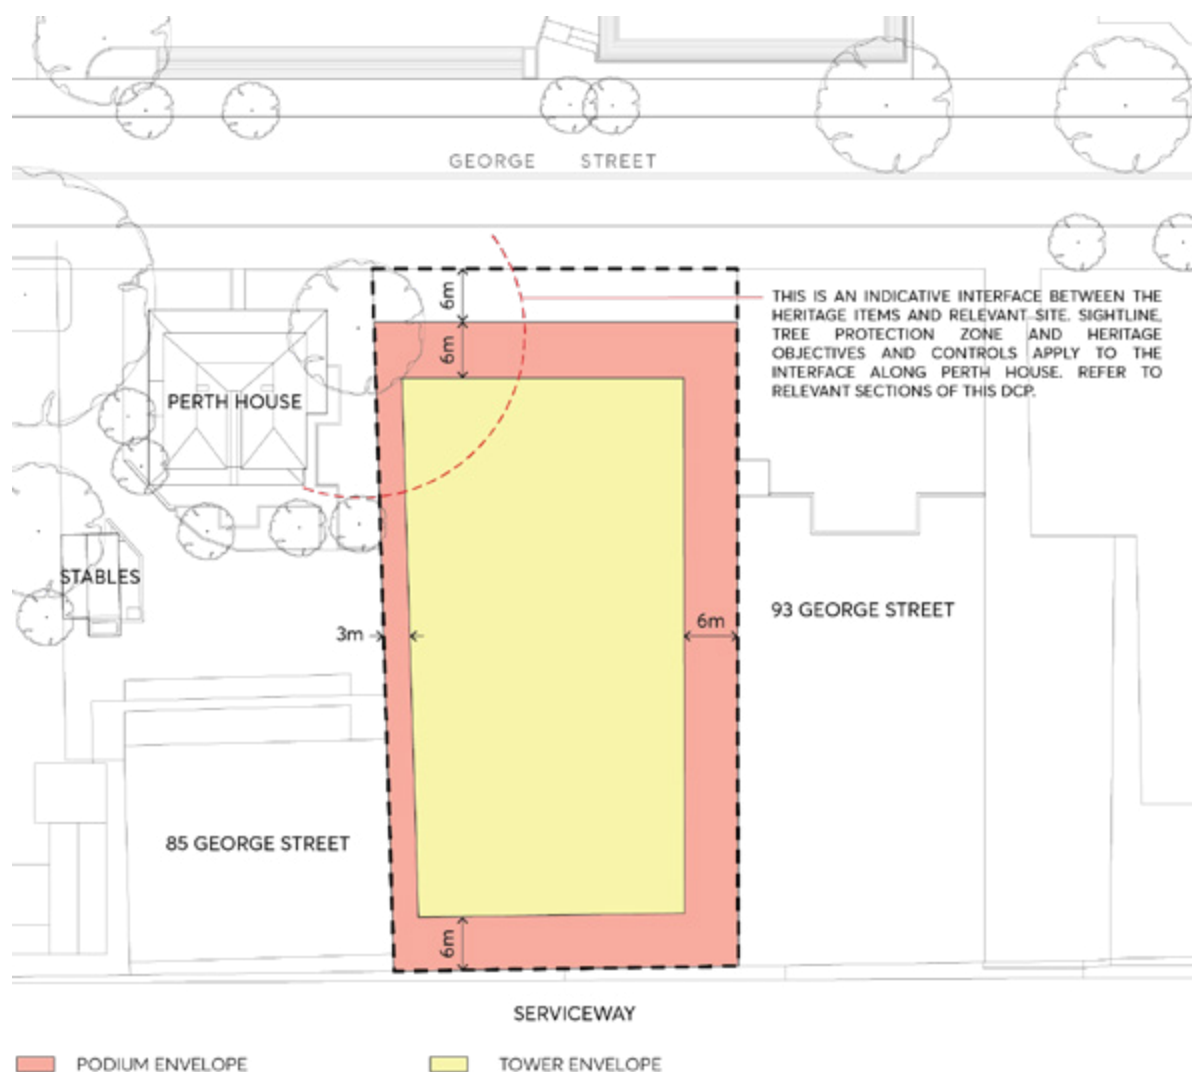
Building Setback Control Diagram (Source: Fender Katsalidis Architects)
